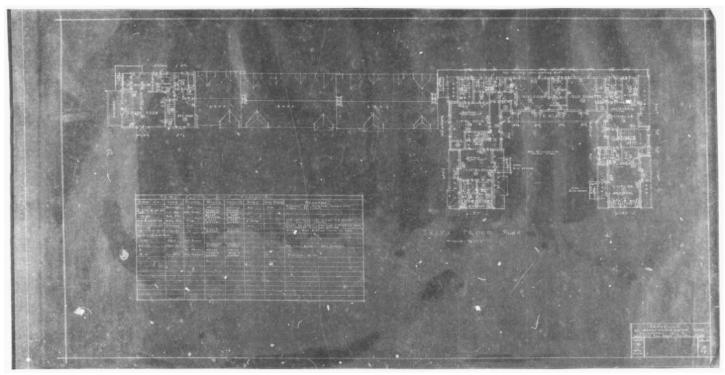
Beauville, Third Floor Plan – 1928 (4 of 7)
